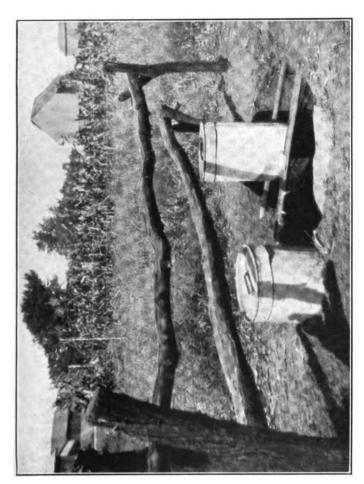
Latrine showing method of fixing pedestal shafts.
